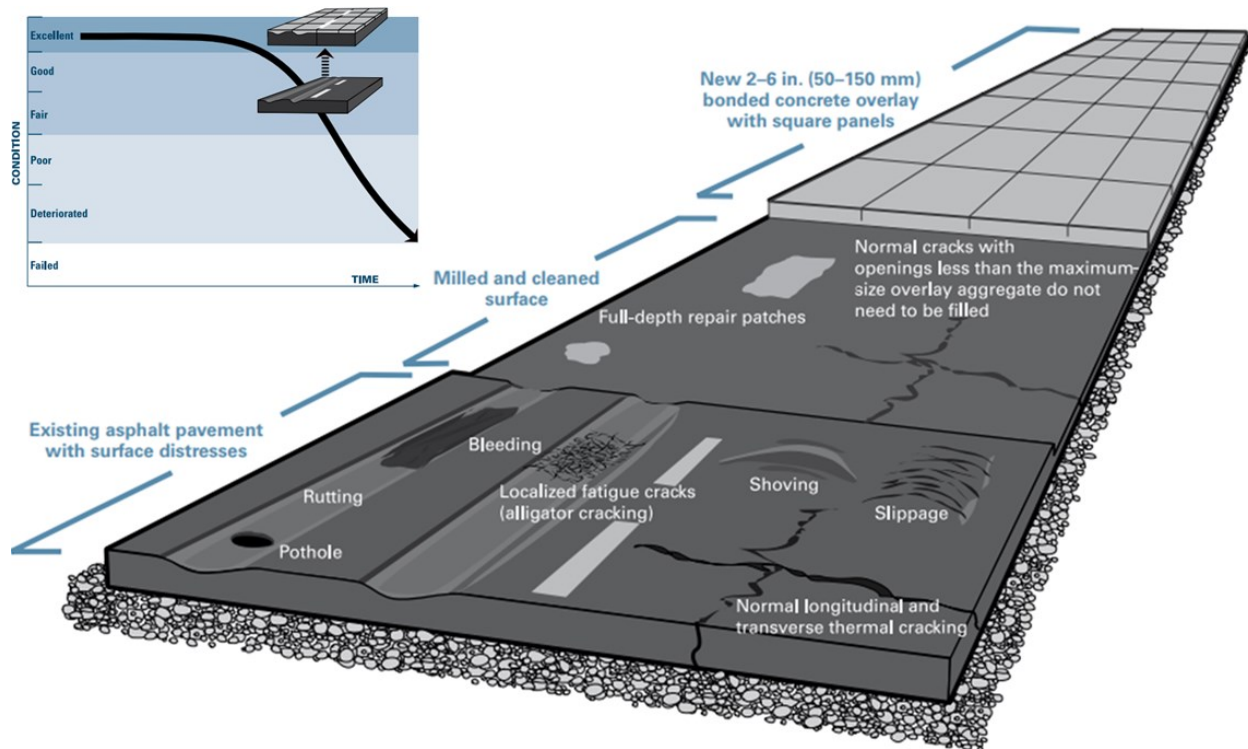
BCOA of good or fair condition concrete pavement with surface distresses (Harrington et al. 2014)
